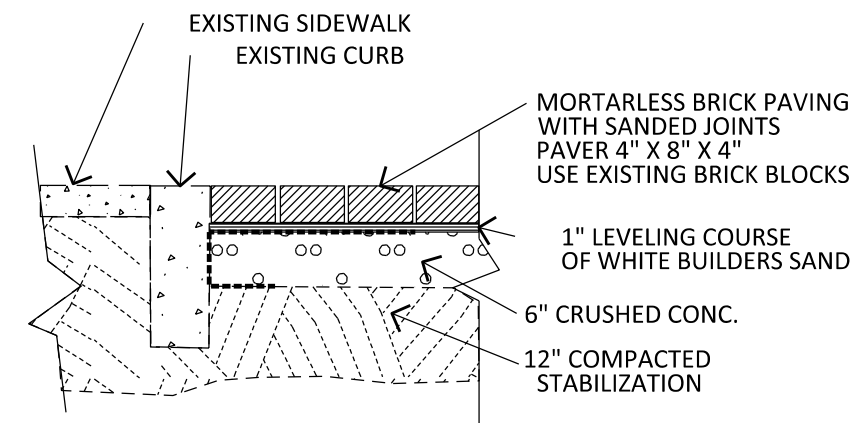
DETAIL- BRICKBLOCK PAVER APPLICATION AGAINST CURB-TREE WELL
